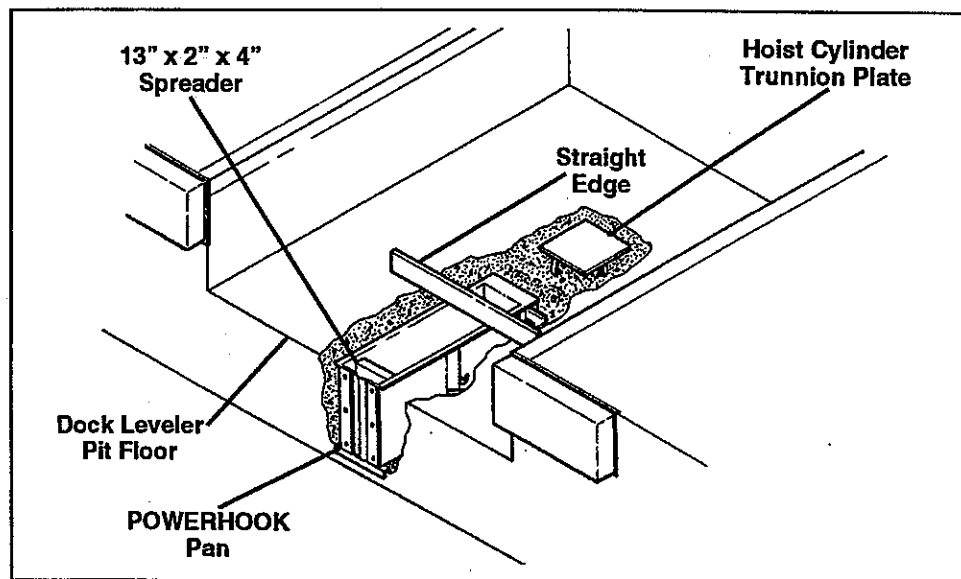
POWERHOOK Pan and Trunnion Plate In Pit
